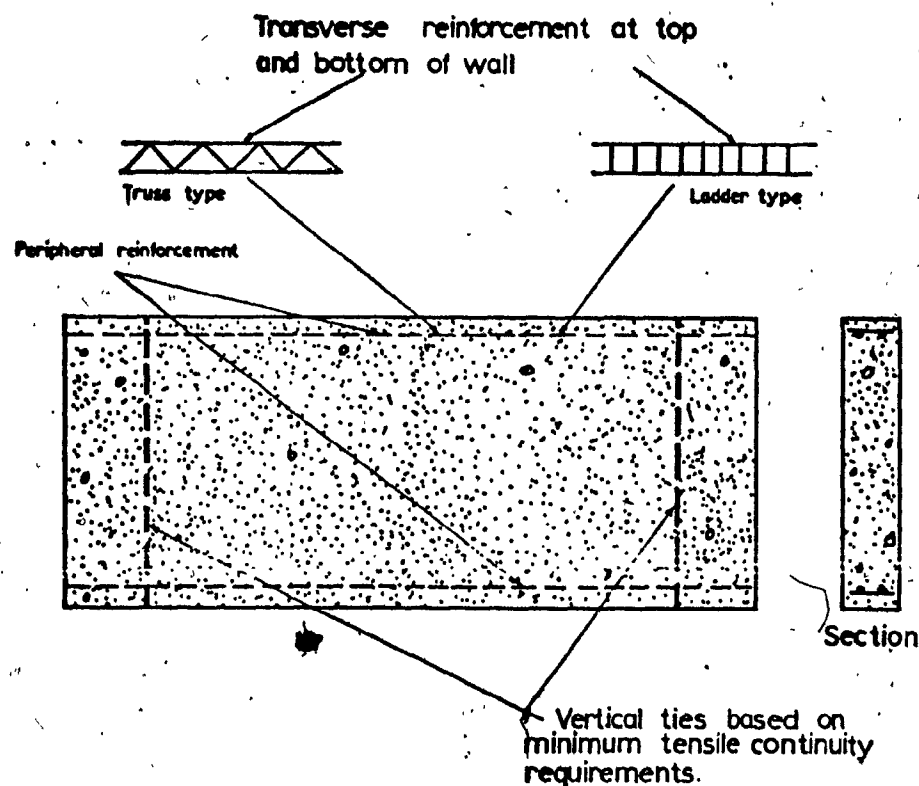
Typical Peripherally Reinforced Precast Concrete Wall Element
